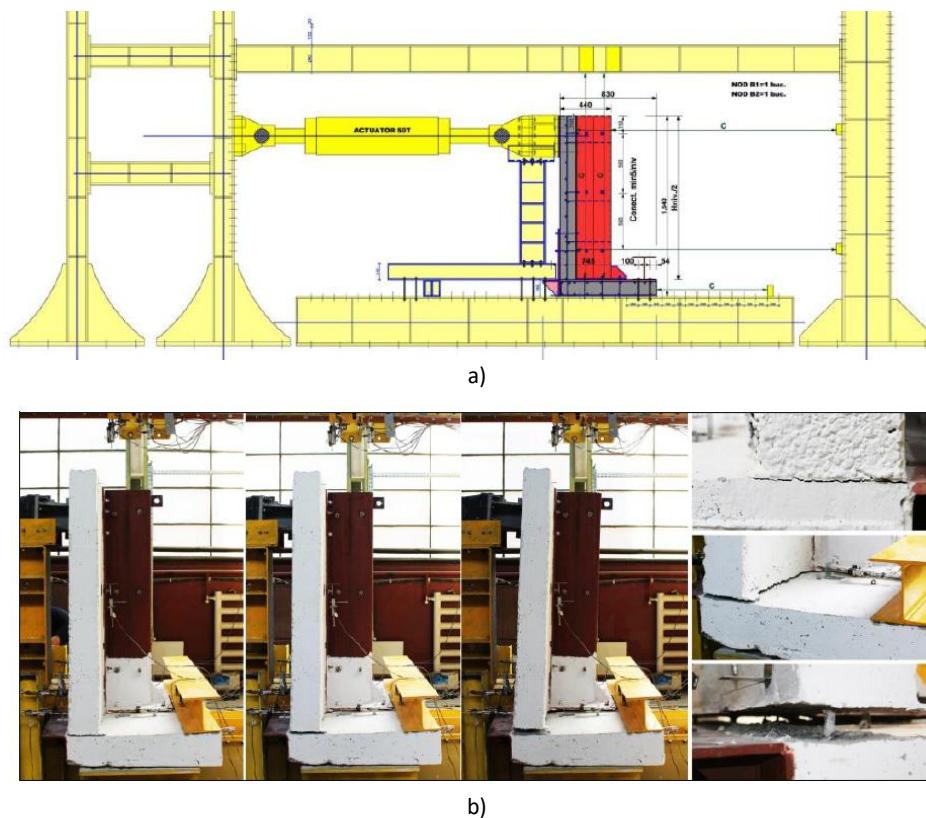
Testing set-up for joint specimens (a) and a sample of test images (b).
